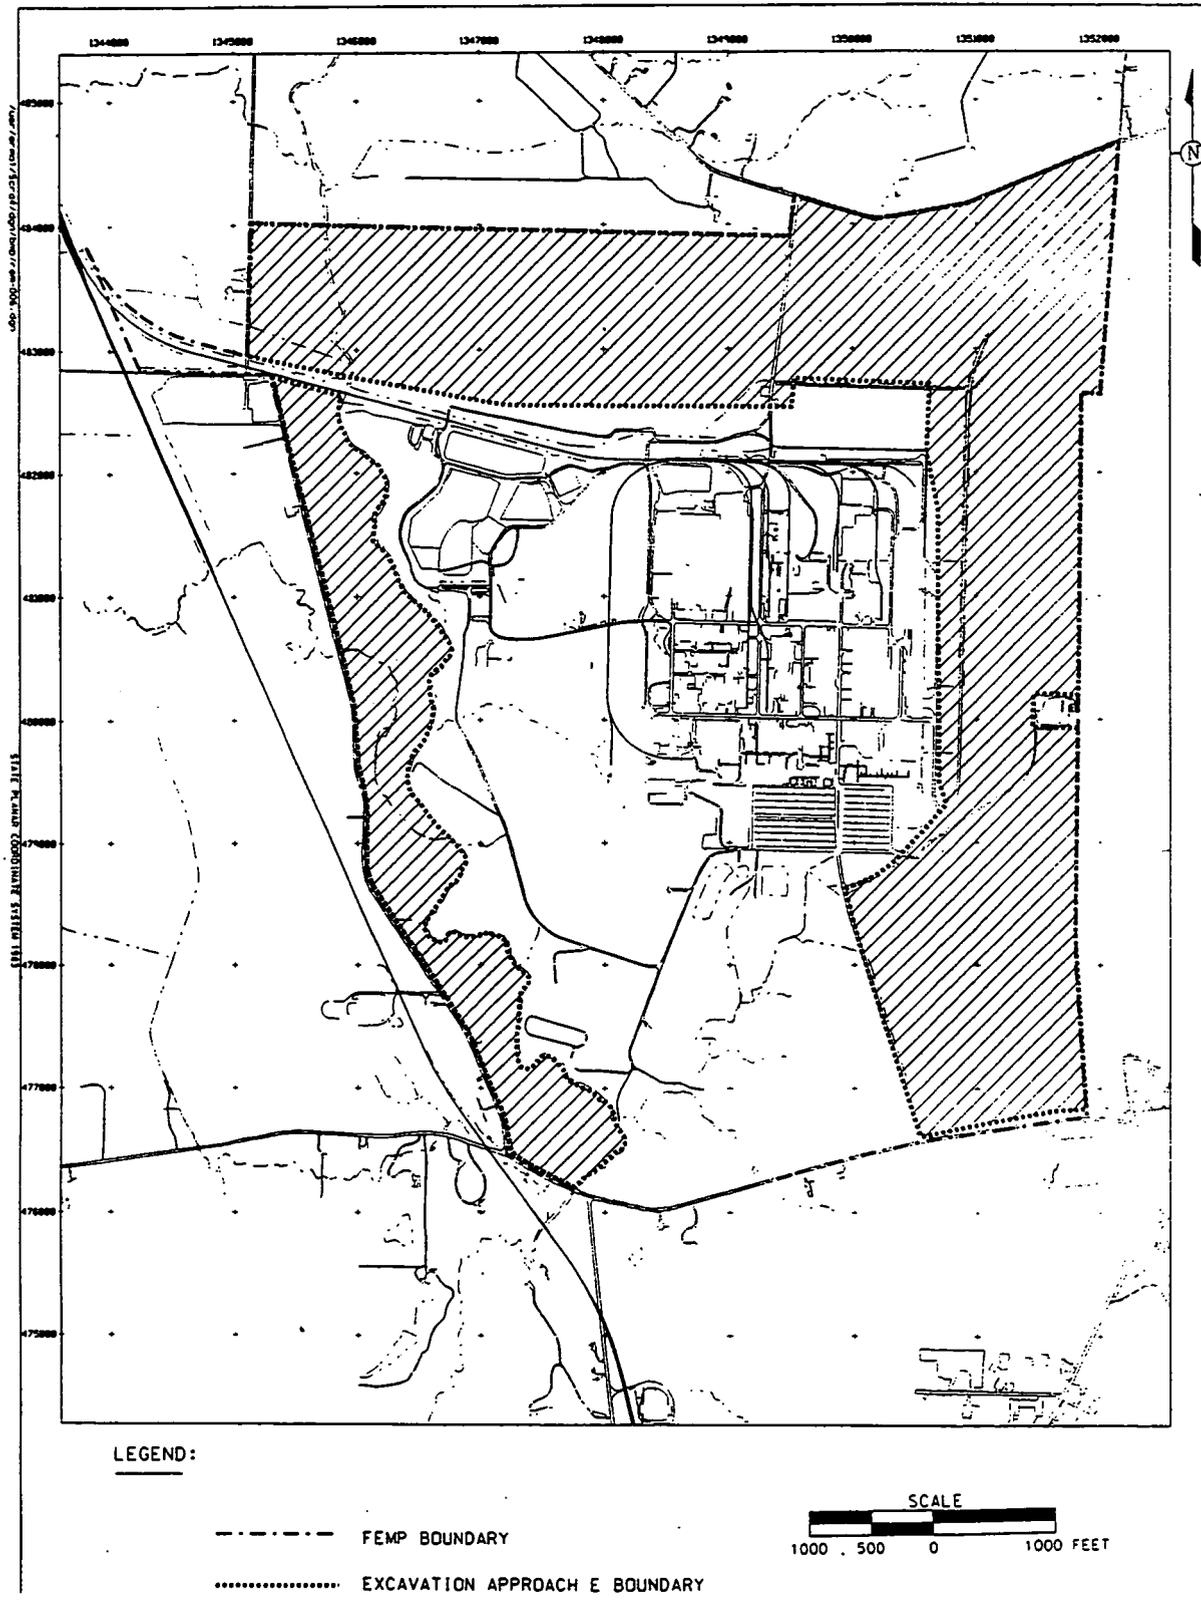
Estimated Excavation Areas for Excavation Approach E
